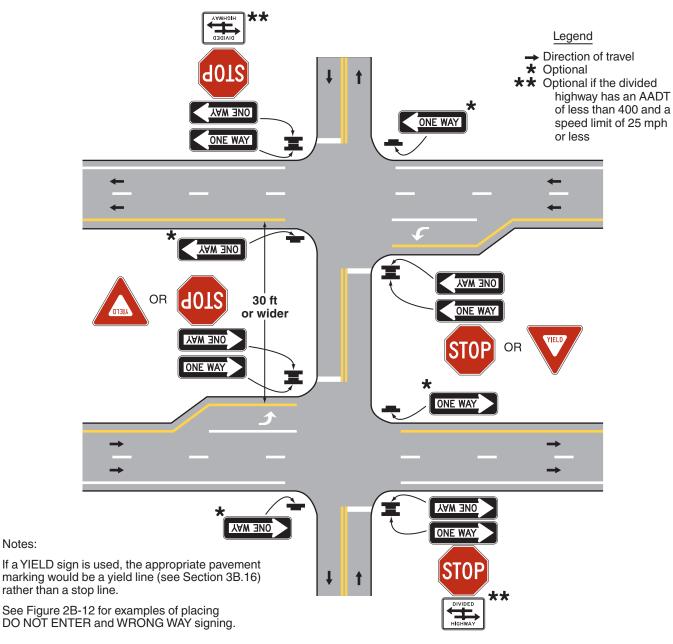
B-15. ONE WAY Signing for Divided Highways with Median Widths of 30 Feet or Wider
